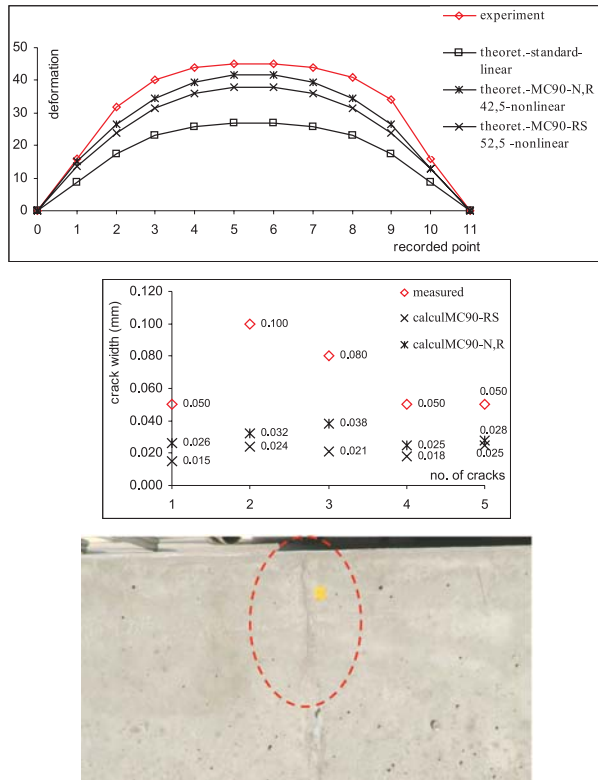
Deflection and crack pattern at upper flange of girder, the real one crack at upper flange
